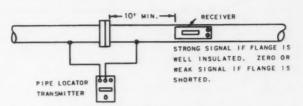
Locating defective flange insulation by the pipe locator method (large pipe.)
